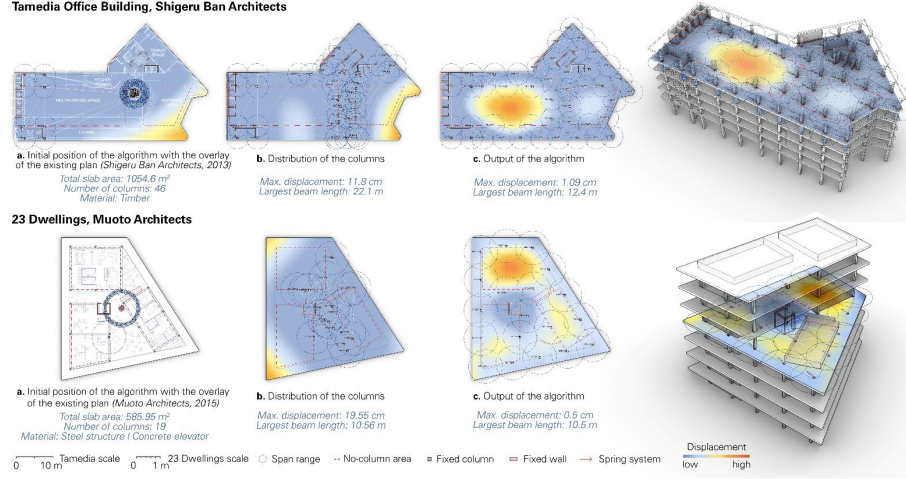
Applications on the real building cases with different materials and layouts. The method is applied on a multi-story timber precedent named Tamedia Office Building by Shigeru Ban Architects which was designed with an irregular layout with 48 columns. The performance of the method is also tested on a hybrid building precedent with steel and concrete named 23 Dwellings by Muoto Architects. a) Initial position. b) Reciprocal distribution of the columns considering the given inputs. c) Output of the algorithm.
